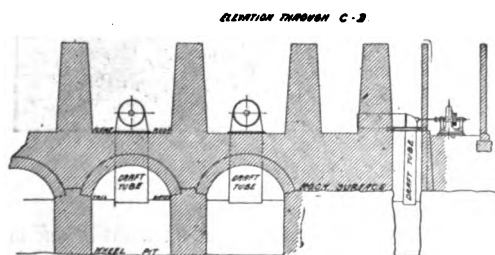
THE MASSENA ELECTRIC GENERATING PLANT.—ELEVATION THROUGH C-D.
